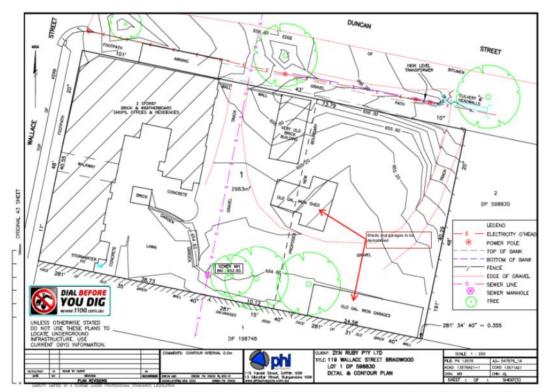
Survey Plan showing proposed subdivision boundary (black) and existing buildings to be demolished labelled.
